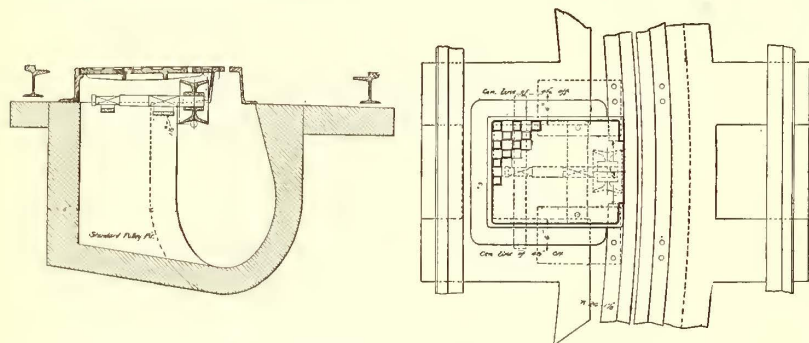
HAND DEPRESSOR, CABLE CROSSING—CITY PASSENGER RAILWAY.
